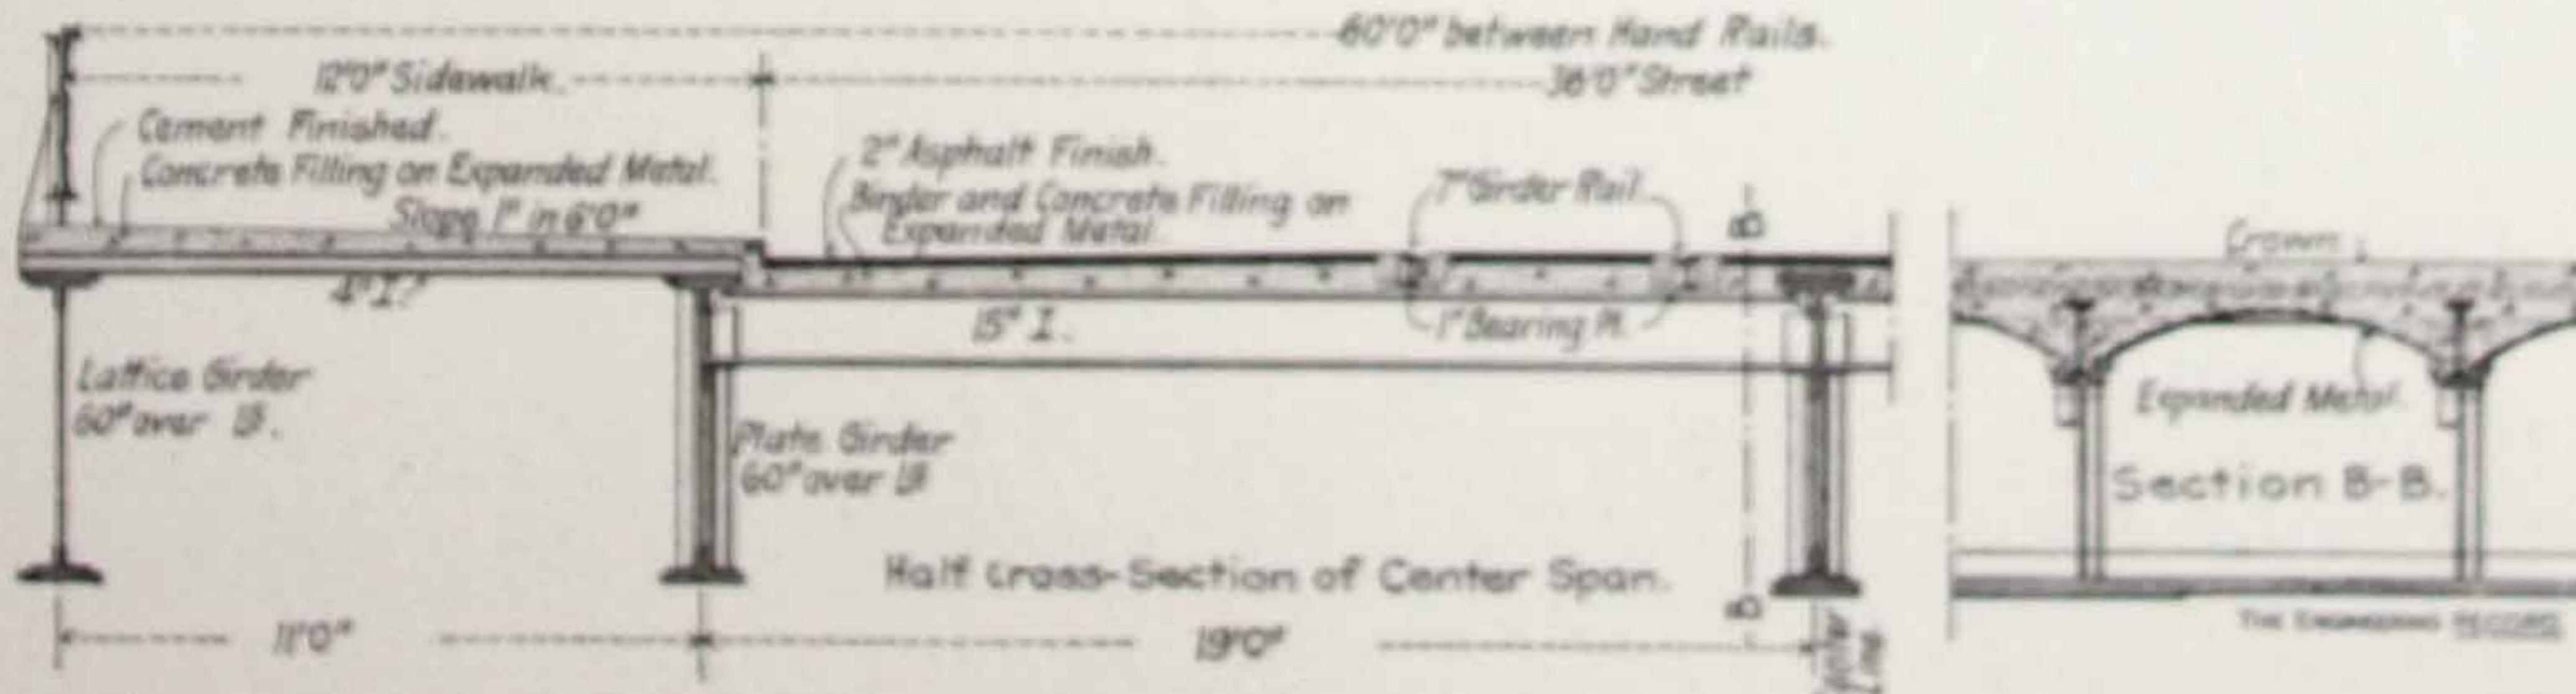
Expanded Metal-Concrete Highway Bridge, near Pittsburgh, Pa.
